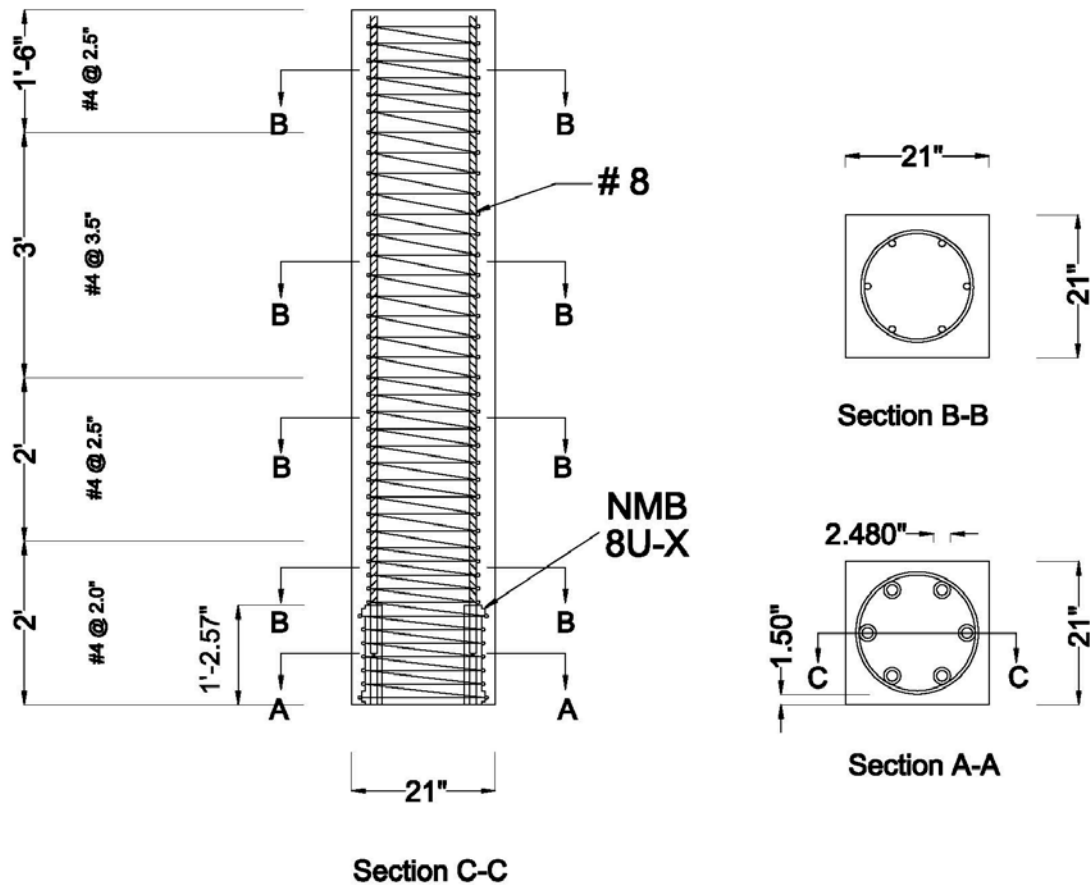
Column and footing details for the column to footing tests using NMB splice sleeves.
